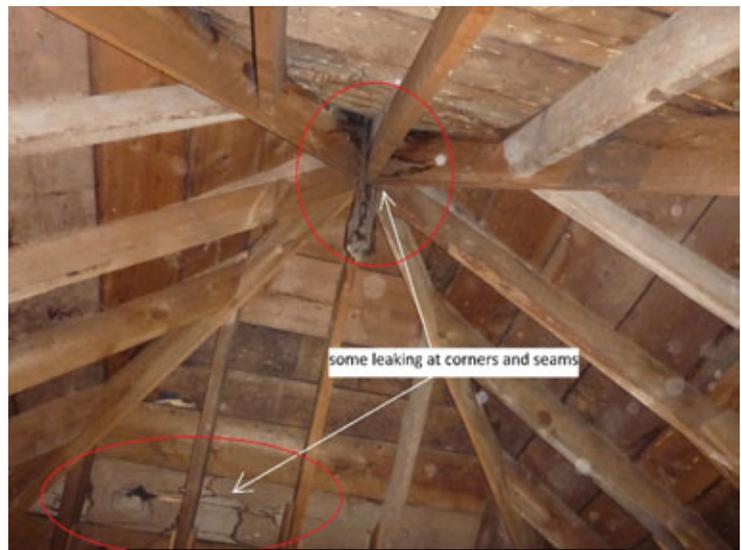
the roof structure is in good condition (cupola roof shown)
